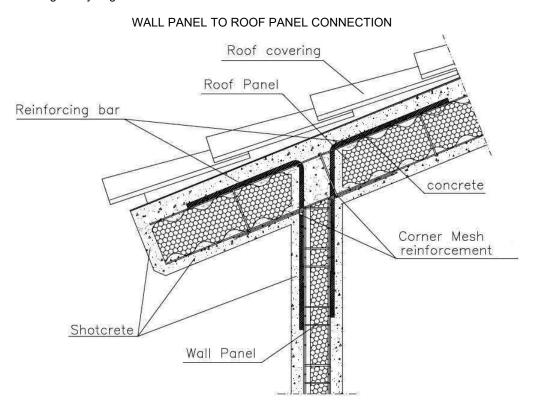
TYPICAL INSTALLATION DETAILS (Continued)
